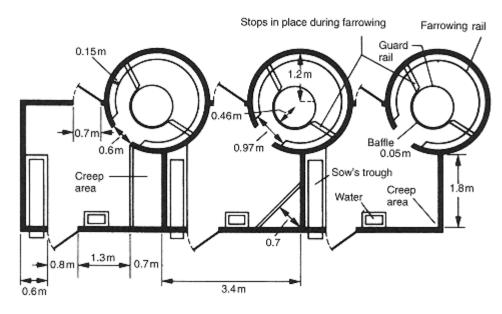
Ground plan of a Ruakura round farrowing house.
